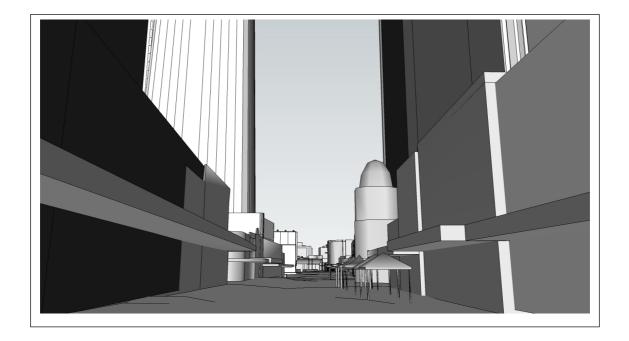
10m upper level (tower) setback - looking north at street level towards the River
